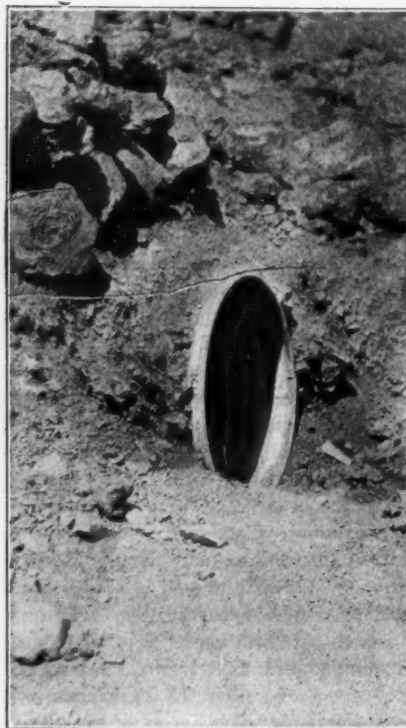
A 24-in. Corrugated Iron Culvert Pipe Under an Earth Fill on the Northwestern Pacific
